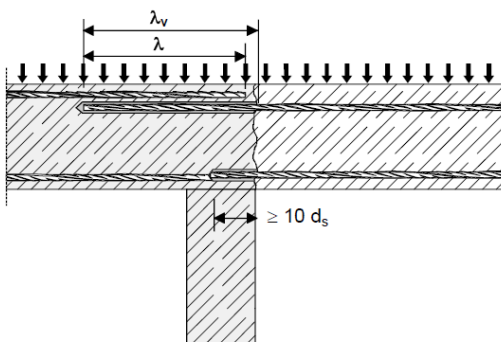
Overlap joint for rebar connections of slabs and beams
